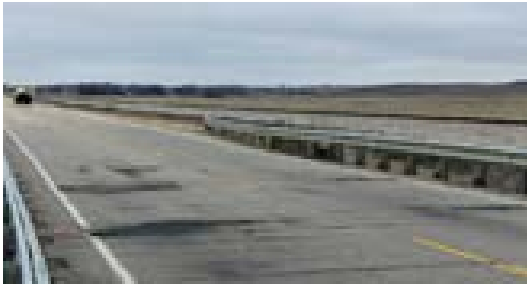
Bridge D-28-D – Cracked and Uneven Bridge Deck
